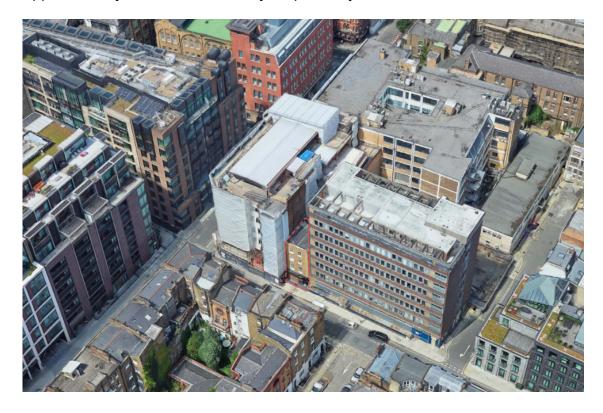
Existing aerial view looking north (site shown outlined in red)
